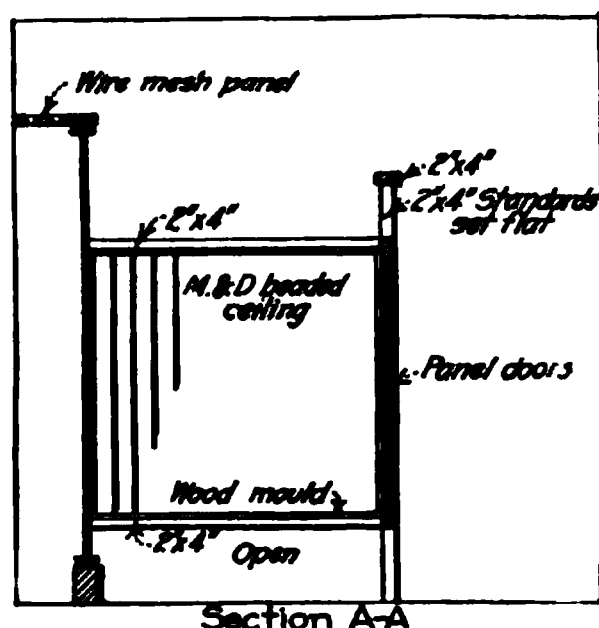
Detail of 2 × 4 and beaded ceiling partition for toilet room stalls.
